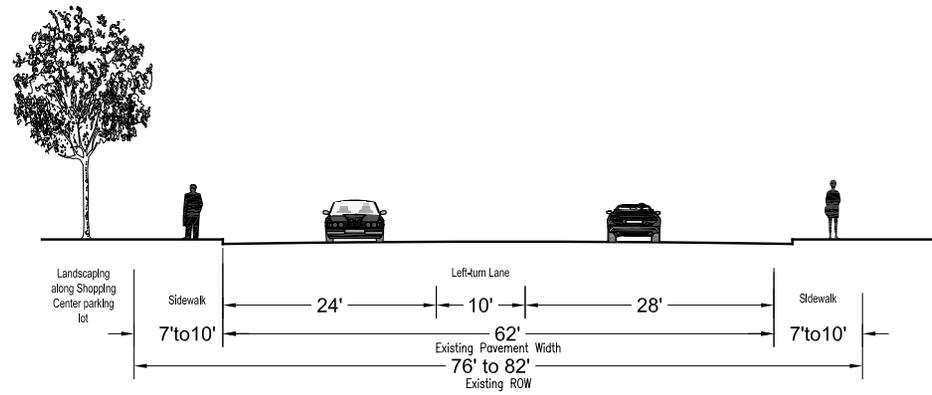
TYPICAL SECTION - RESIDENTIAL
